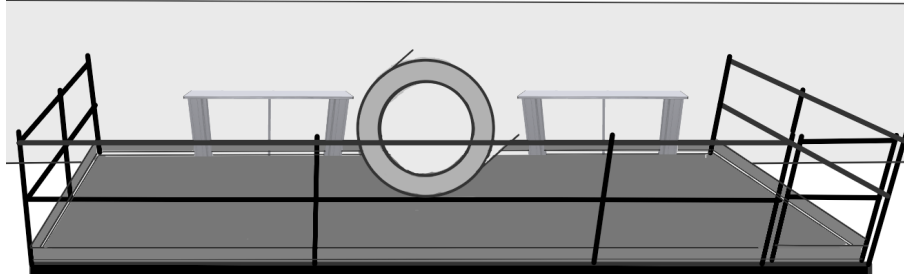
Work bench illustrated alongside the jacket, with a leg obstructing the platform.
